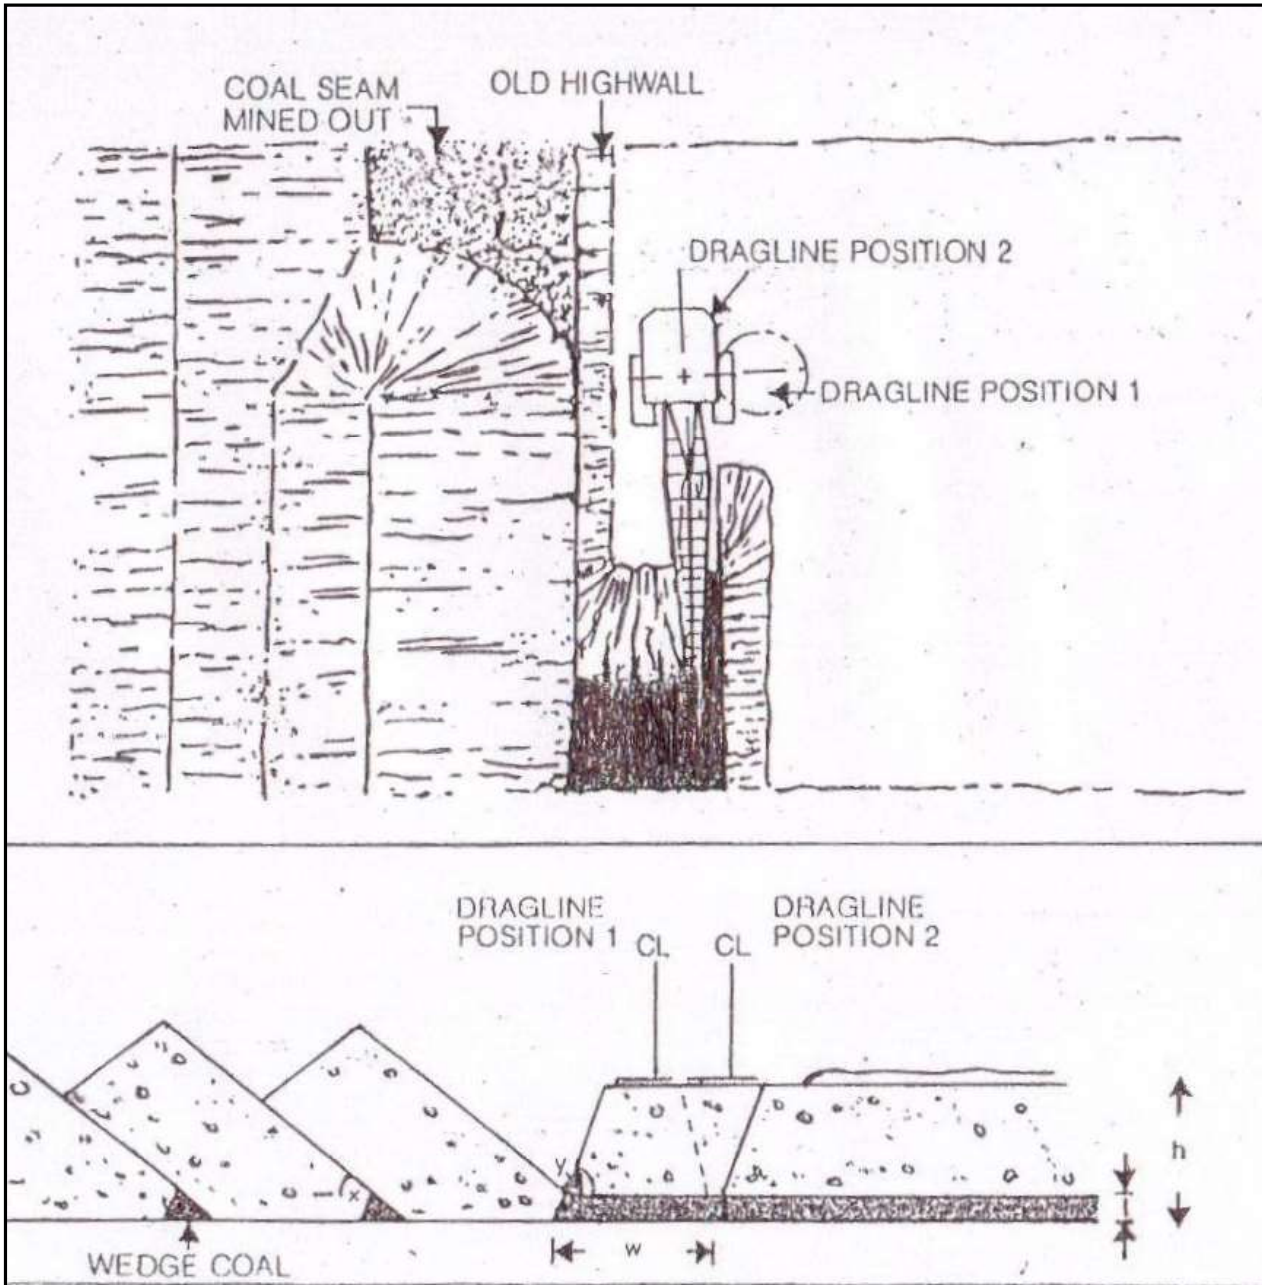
Dragging Stripping Method (Plan & Elevation X-Section)
